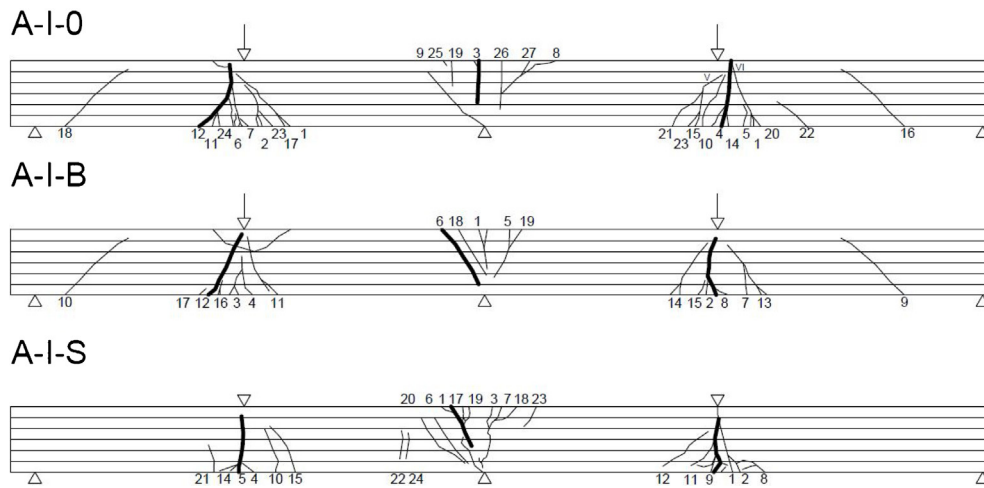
Crack pattern in A-I series beams (destructive crack was marked with a thick line).
